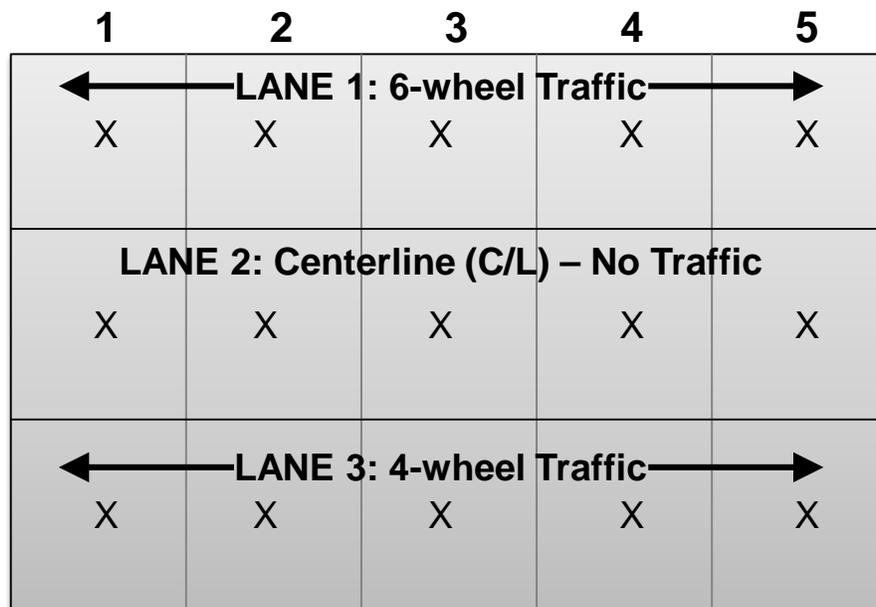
Schematic of NAPTF CC1 rigid pavement items cross-sections
